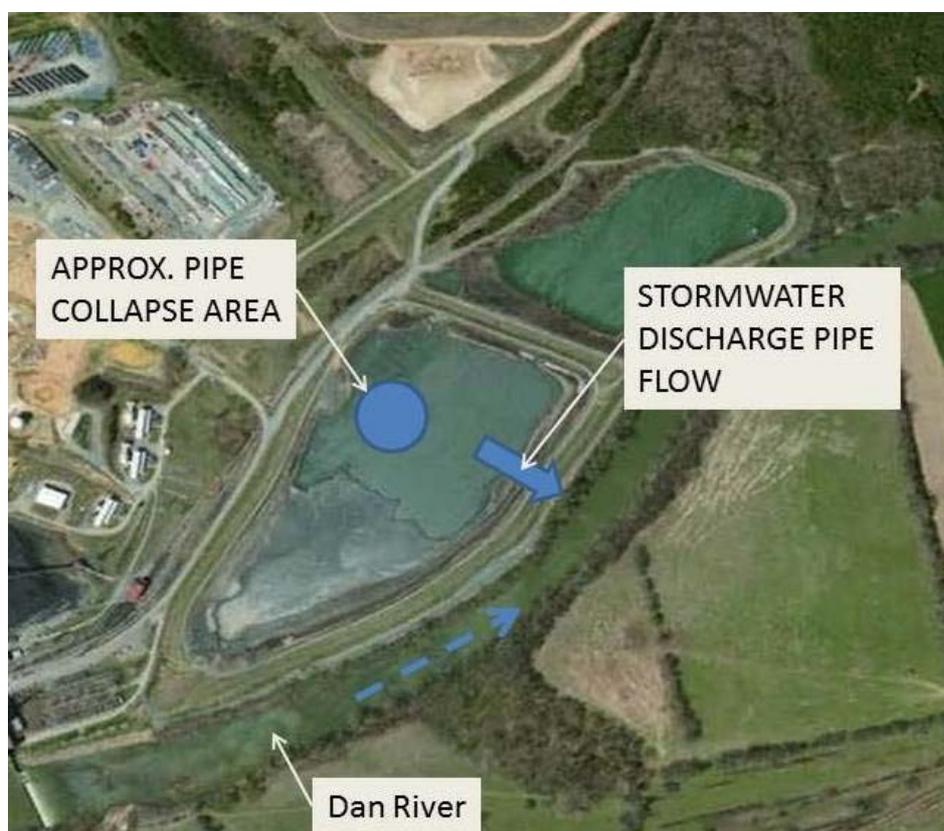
Dan River Site Plan,¹¹ with highlights by the authors
